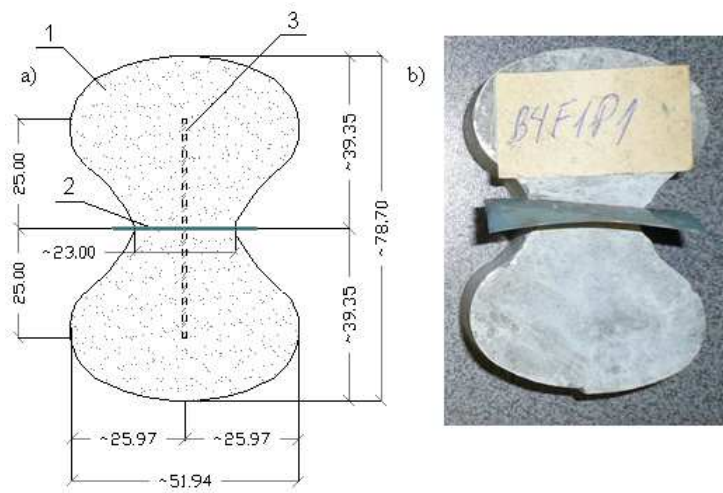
Formation of pullout test samples: 1 – concrete matrix; 2 – plastic separator; 3 – embedded steel fibre
